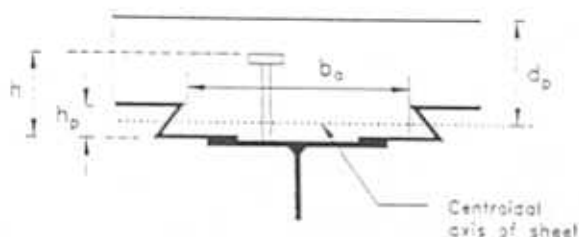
Beam with Profiled Steel Sheetting not Continuous Across the Beam
